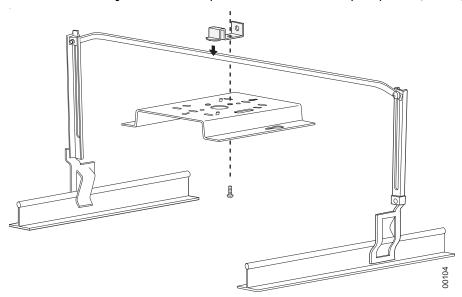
Attaching the Mounting Bracket to the Box Hanger
